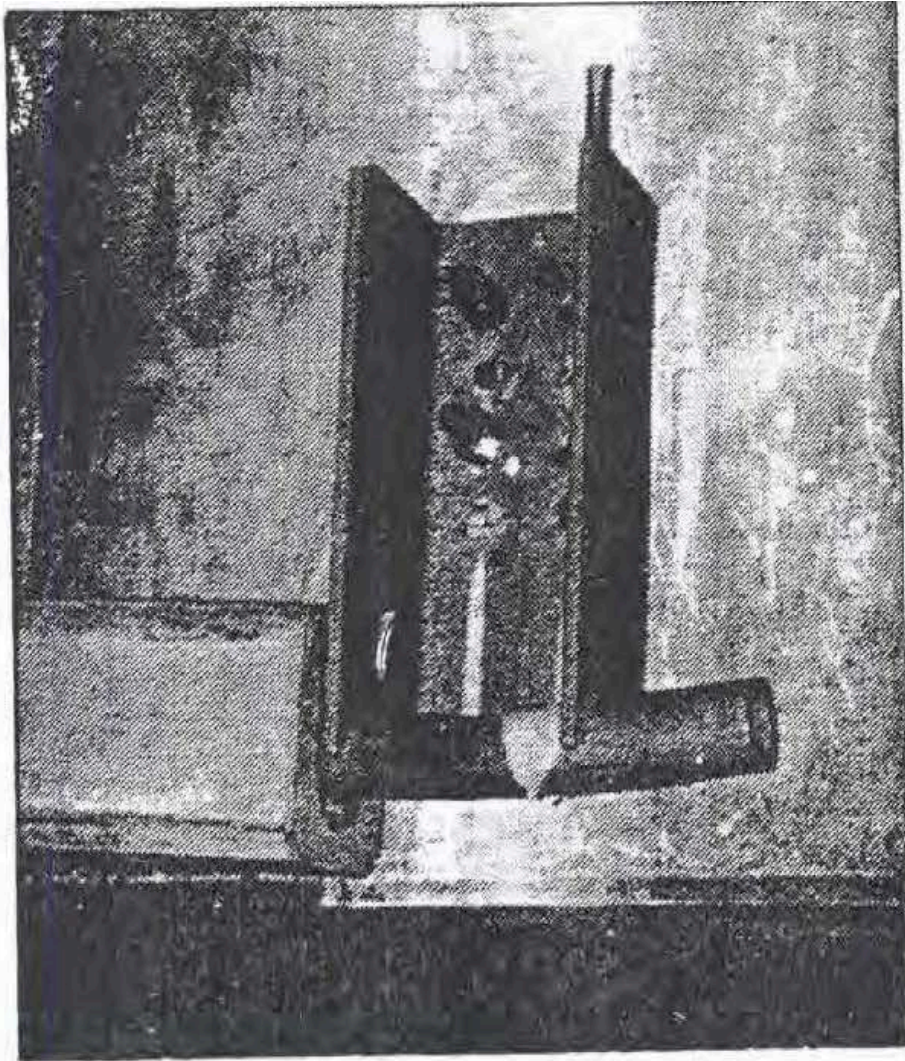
Structural steel bracket bolted to the side of a beam at a low point; The PT is encased in concrete for protection
